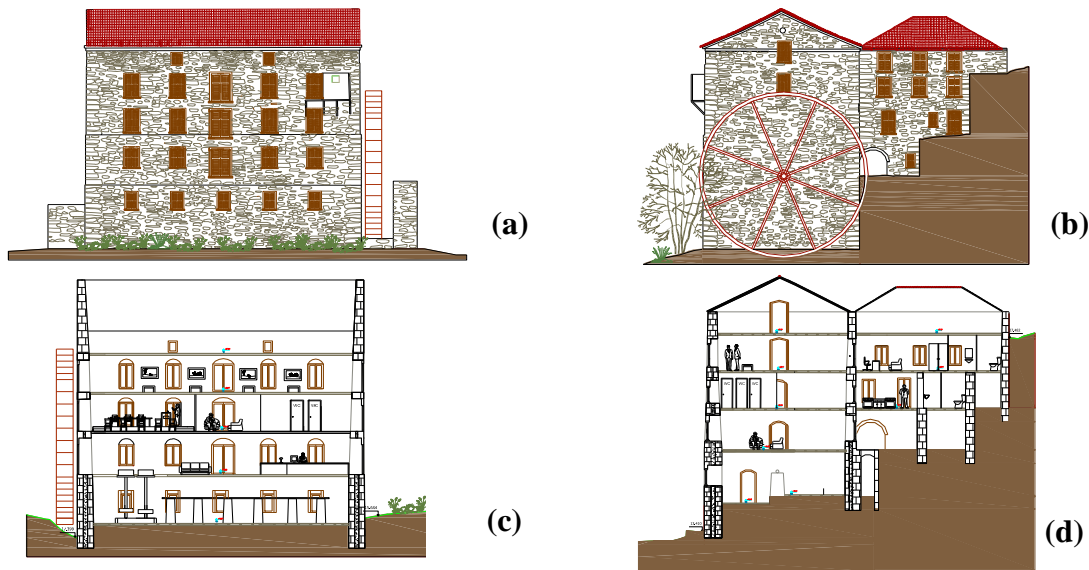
The north, (a) and west facade, (b) and elevations A-A, (c) and B-B, (d)
